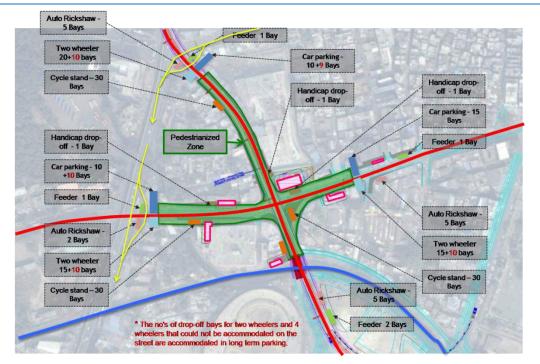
CONCEPT LOCATION FOR PICK & DROP FACILITIES
